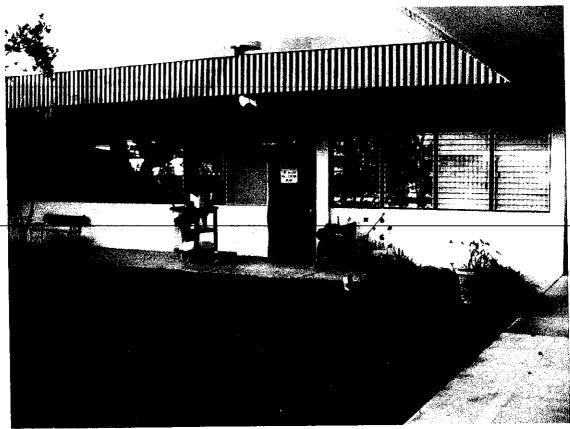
T-111 exterior finish - Building 4 Photo 10: Jalousie windows - Building 4 Photograph Date:
